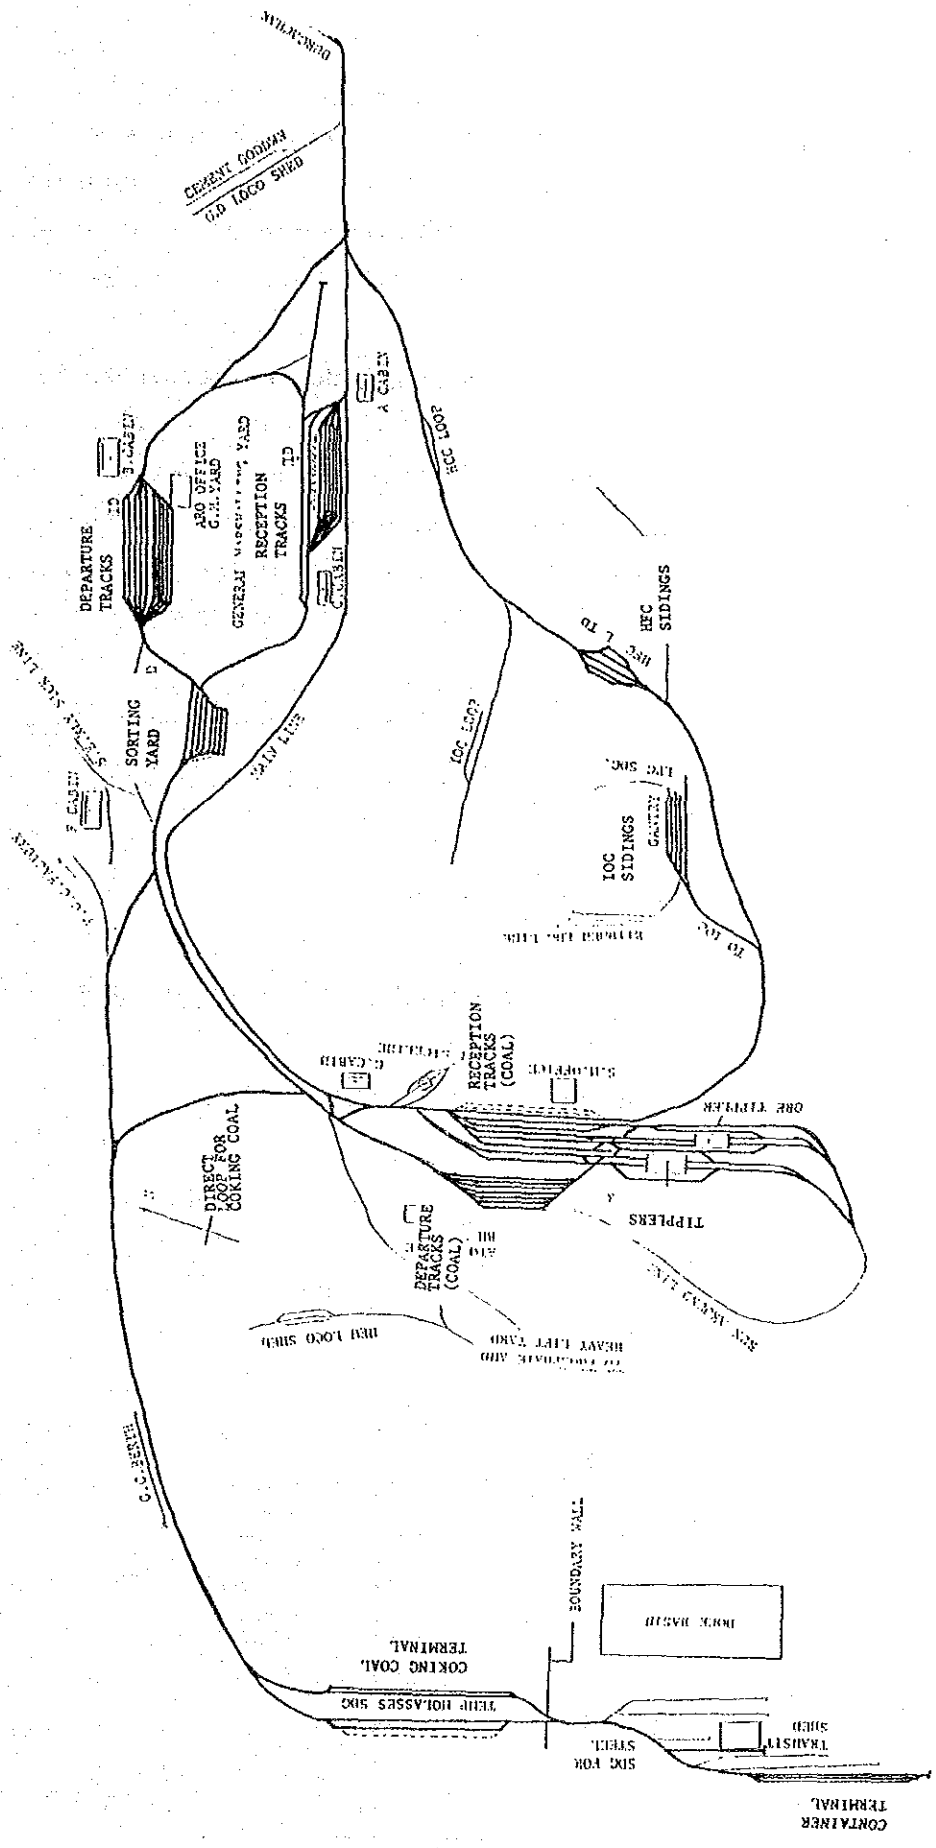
General Plan of Haldia Railway System (1995)
